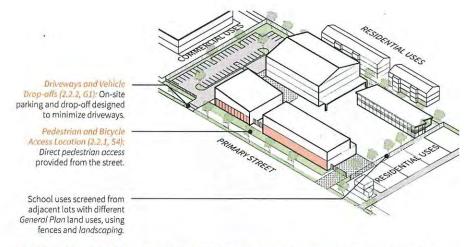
Mid-Block School in a General Plan Growth Area or designated Urban Village - A school in a General Plan Growth Area or designated Urban Village with buildings oriented towards the street, direct pedestrian access from the public realm, and screened from adjacent uses.
